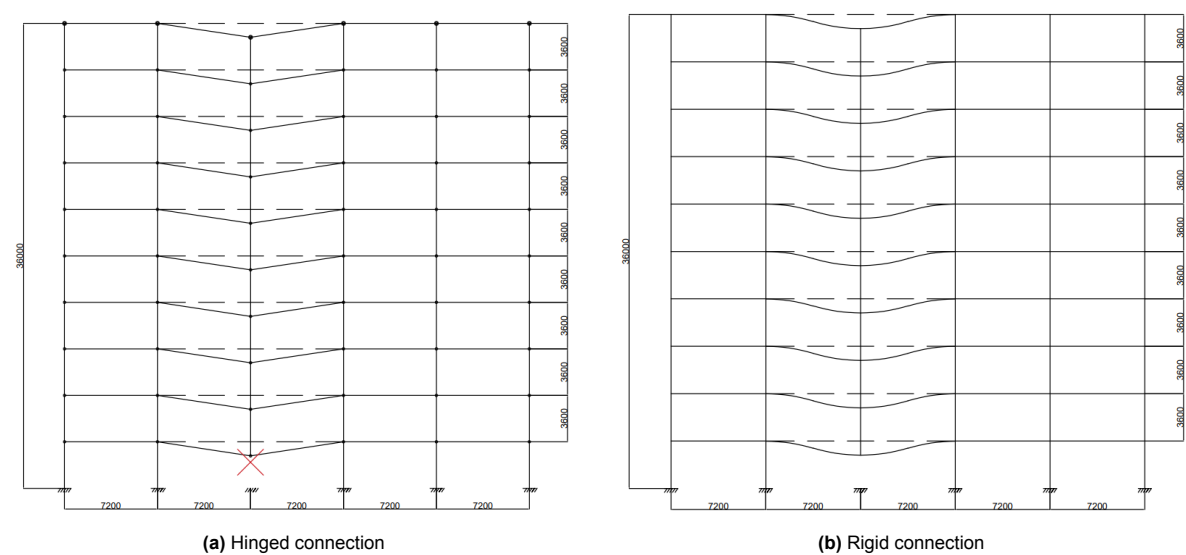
Side view of the building where an interior or facade column is removed. (a) Hinged connection, (b) Rigid connection
